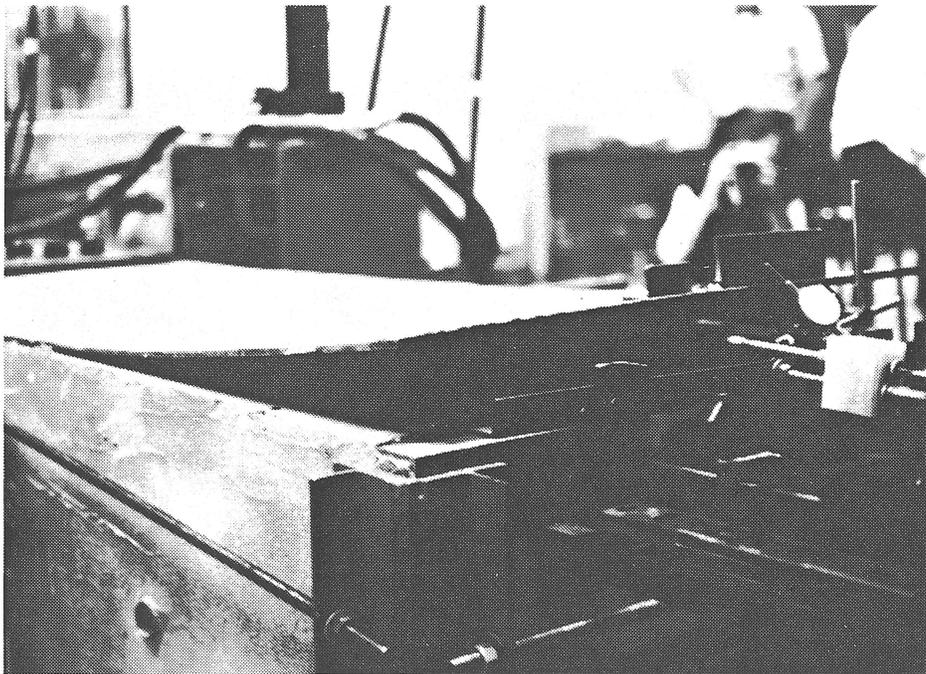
Specimen T-1. Plate Deformation During Final Stages of Testing
